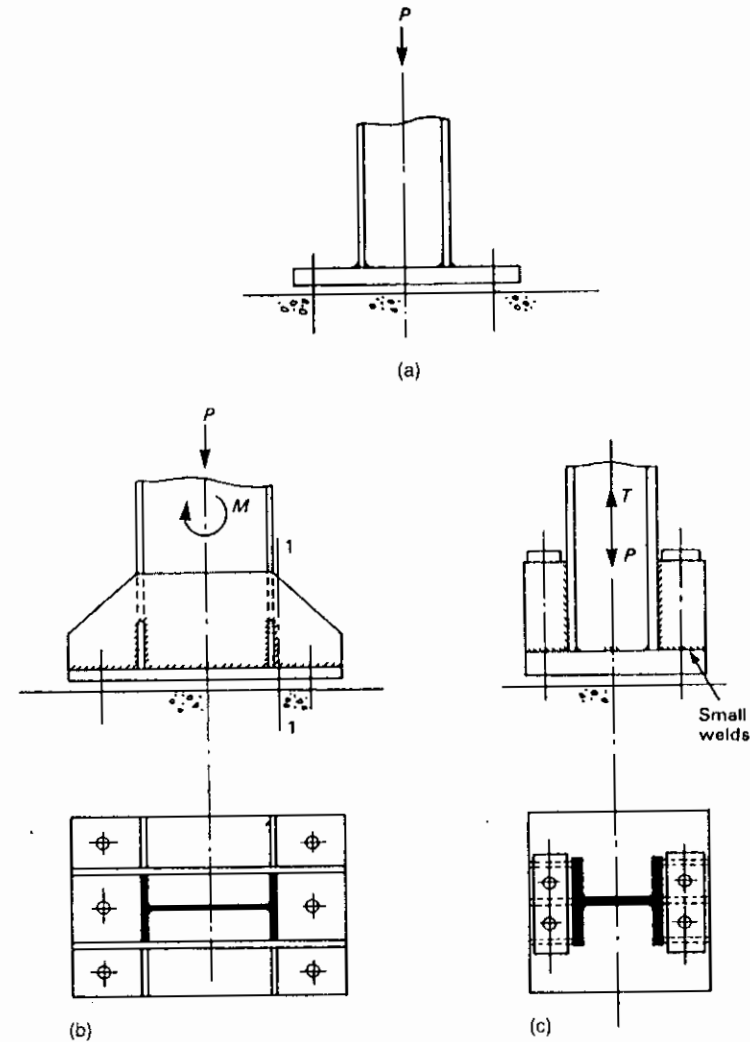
Column bases: (a) slab base, (b) haunched base, (c) bolt boxes.
